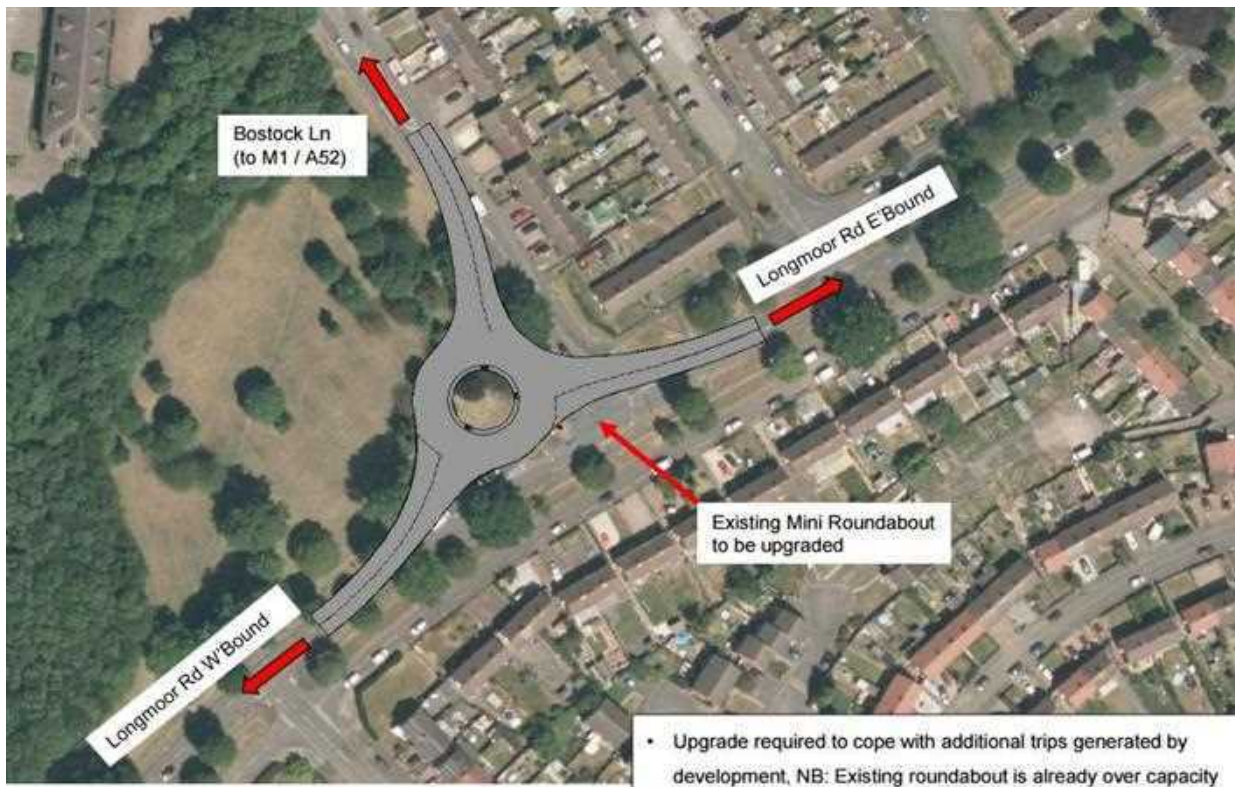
Bostock Lane / Longmoor Road Preliminary Improvement
